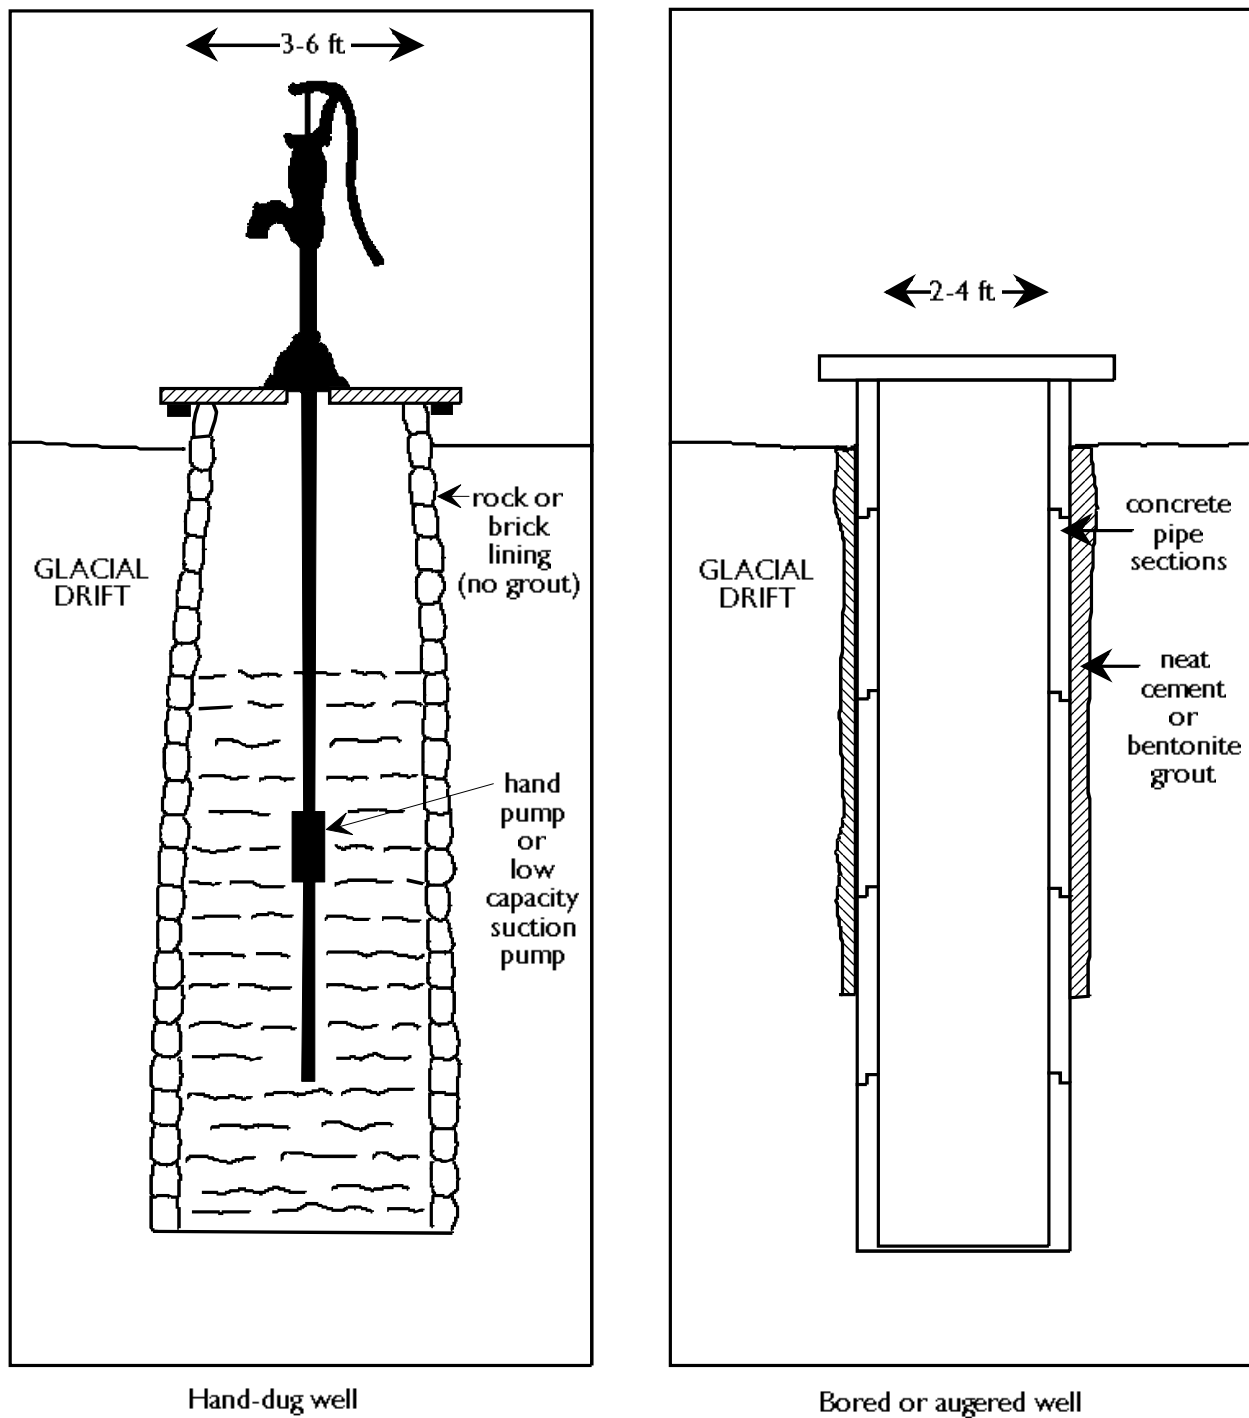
Typical construction used for private hand-dug and augered glacial drift wells.
